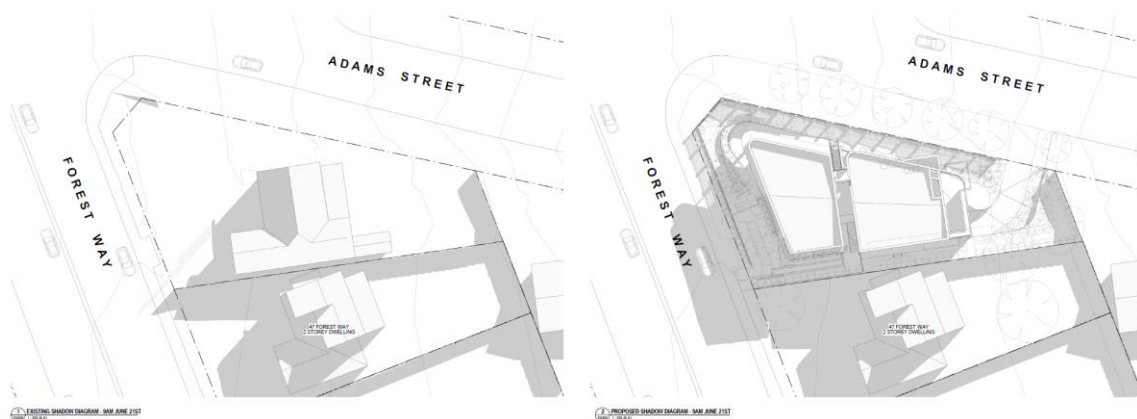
the existing and proposed shading impact to the southern adjoining development at 9am
